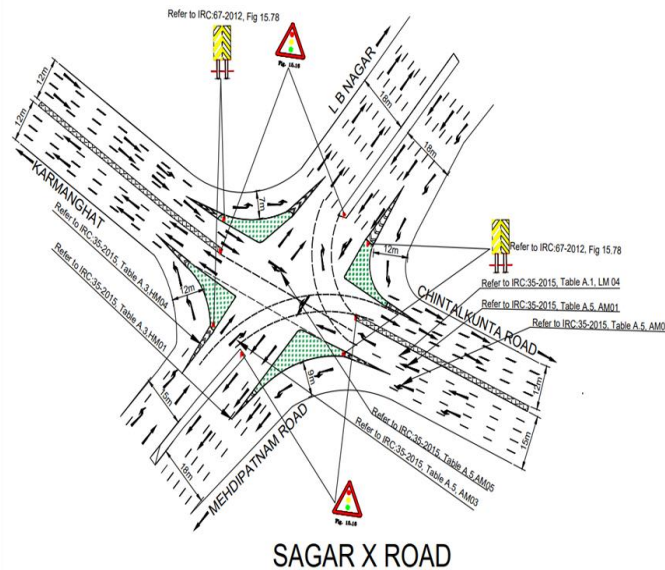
Proposed Intersection Design for Sagar X Road.
